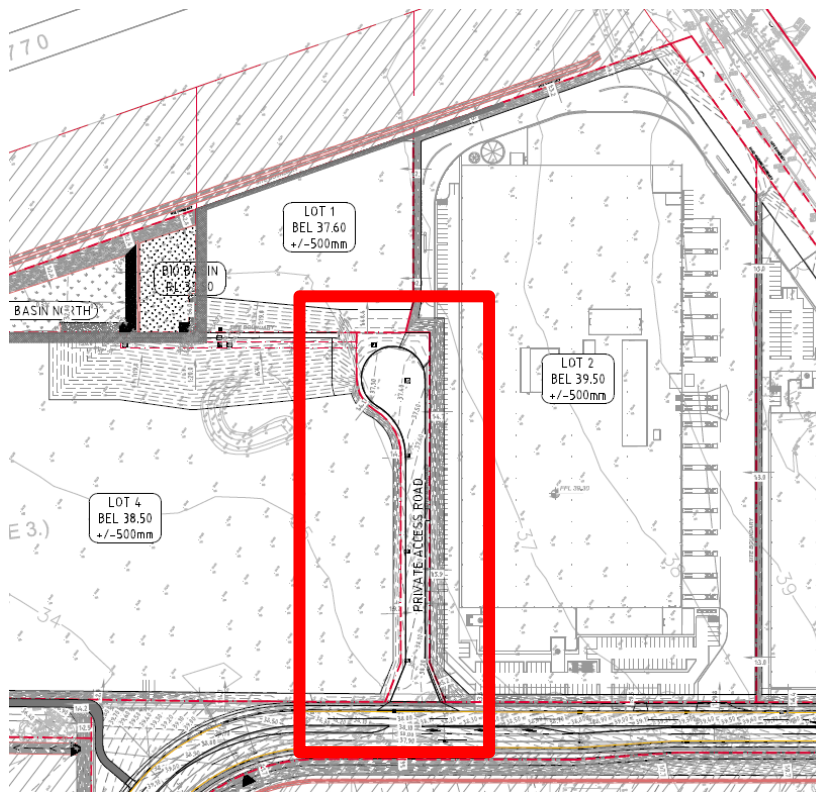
Updated Bulk Earthworks Plan for Lots 1-4 under MOD 3
